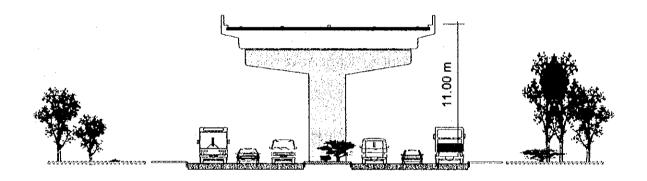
Typical Section for Over Pass Structure on Existing Road
